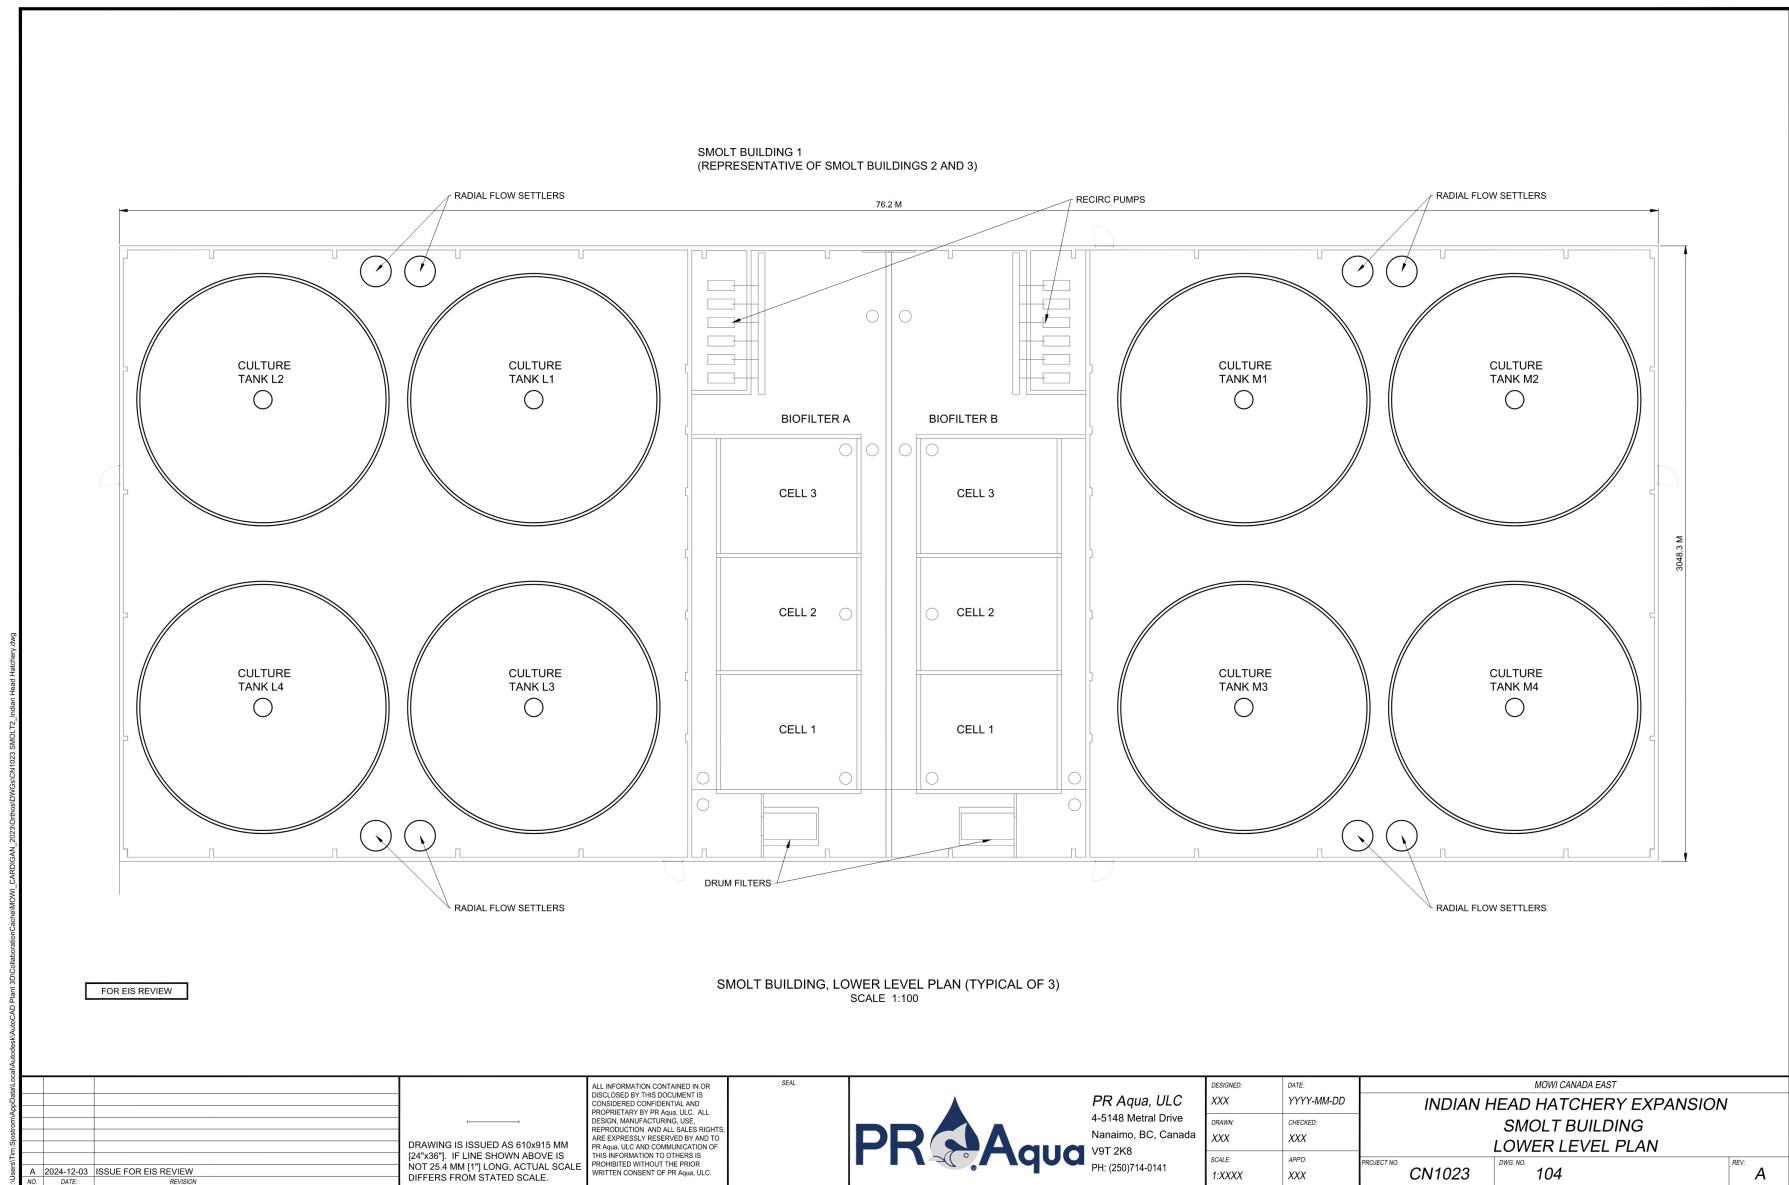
Schematic of Smolt Building 1. Smolt Buildings 2 and 3 have a similar layout.
